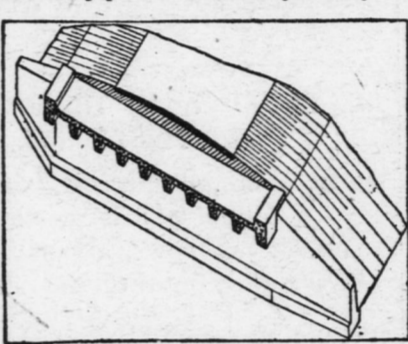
CONCRETE CULVERT STEEL I BEAMS INCASED IN CONCRETE.
